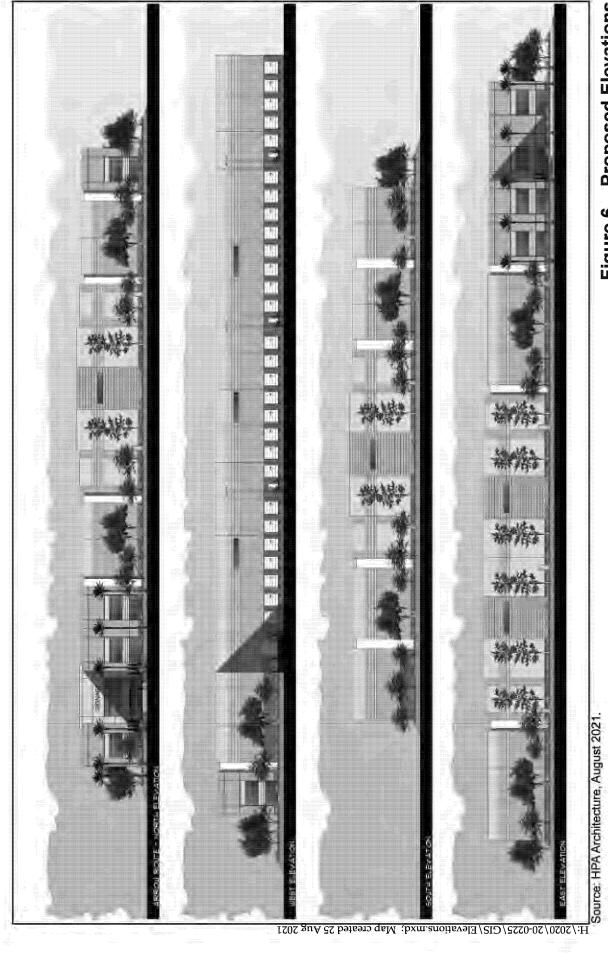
Proposed Elevations 15719 and 15755 Arrow Route Warehouse
